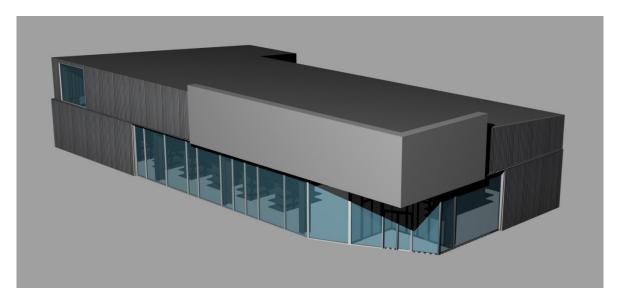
Case Study #4 – Predominately Steel Single-Storey Retail Building
